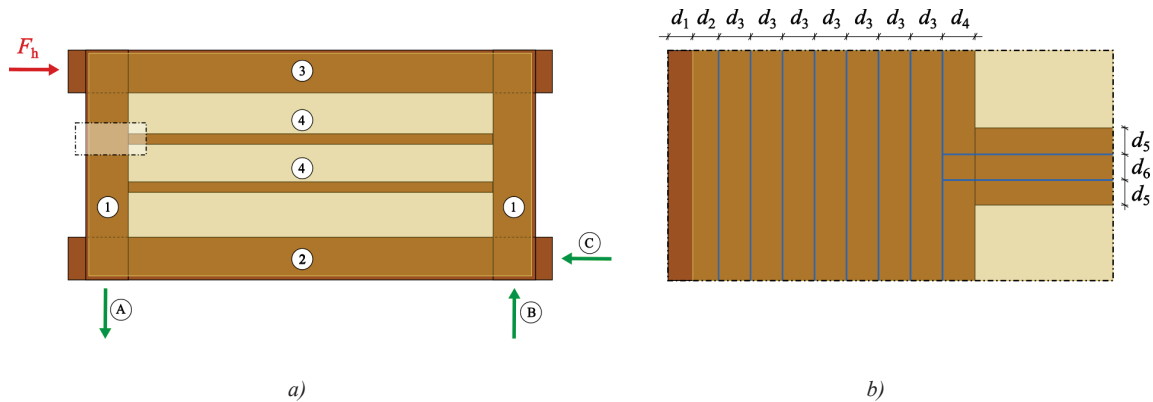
a) Overview of the tested specimen with framing elements labelled with numbers (1: edge studs, 2: bottom rail, 3: top rail, 4: inner rails) and with reaction forces A, B, C induced by the applied force F_h . The dashed-dotted marked area is shown in Figure b). The blue lines indicate the rows, where the fasteners connecting the sheathing to the framing elements are placed.
